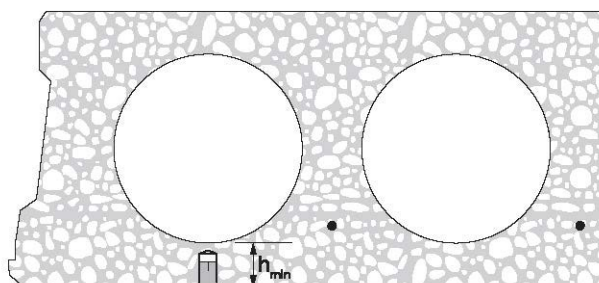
HILTI HDI-P TZ INSTALLATION PARAMETERS IN HOLLOW CORE CONCRETE PANELS
